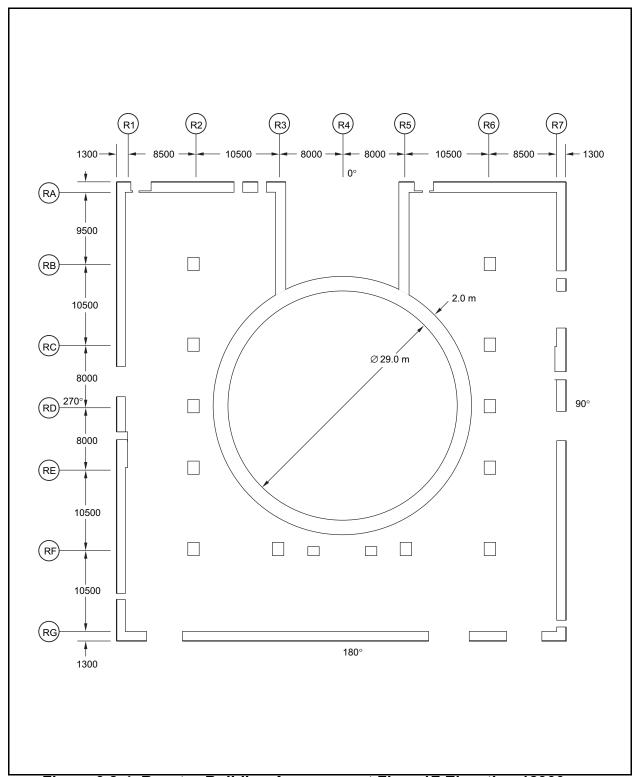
Reactor Building Arrangement Floor 1F Elevation 12300 mm
